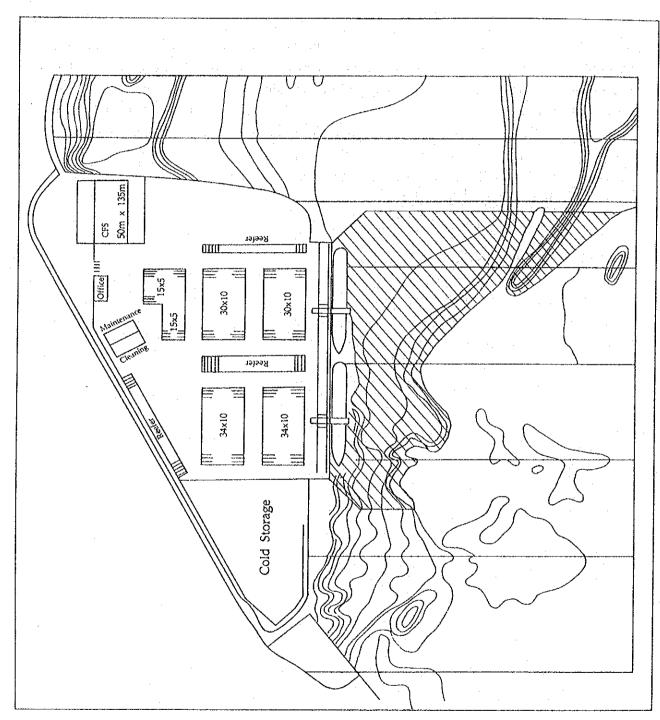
Layout Plan of Unit Cargo Terminal for Short-term Plan
